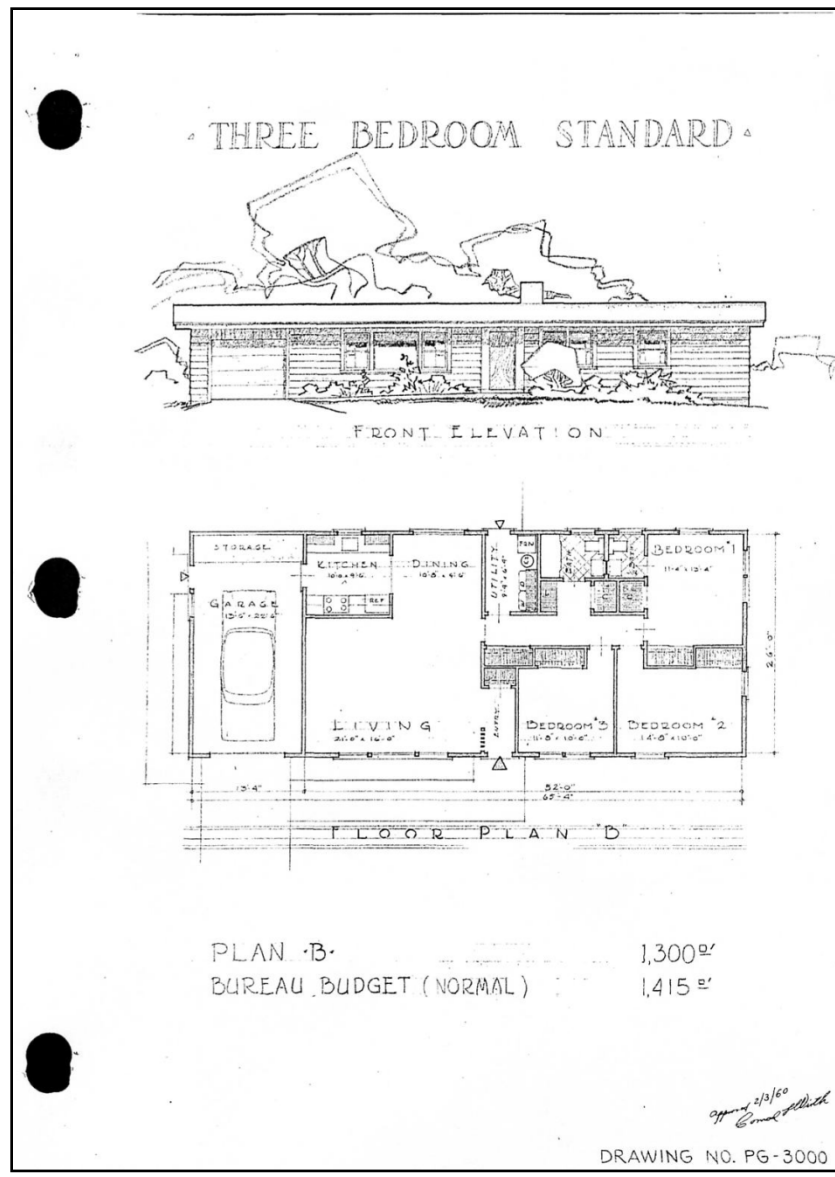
Chosen floor plan and elevation drawing for Residence Nos. 6 and 7, (NPS Dwg No. PG-3000), approved 1960.
